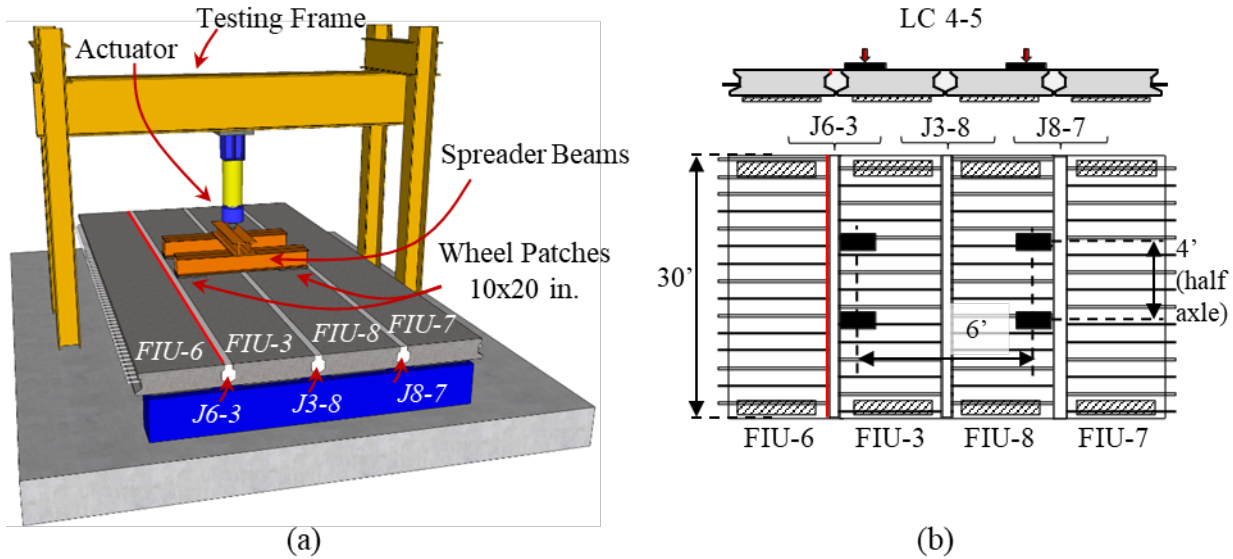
Test setup for Load Configuration 4-5 (a) schematic and (b) plan and elevation view
